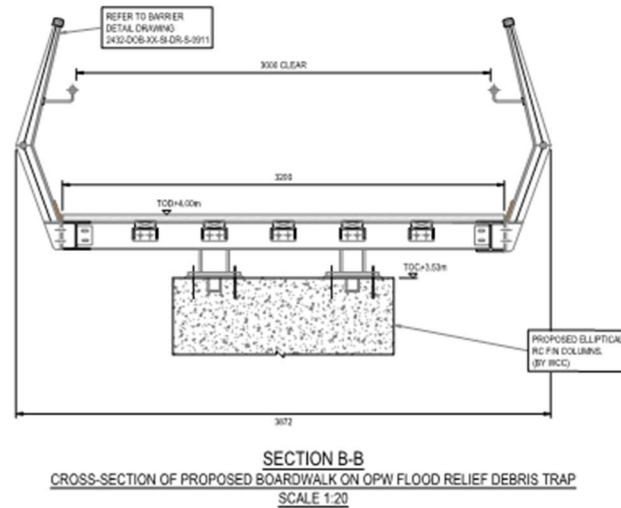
Typical Boardwalk section across WCC Debris Trap Columns
